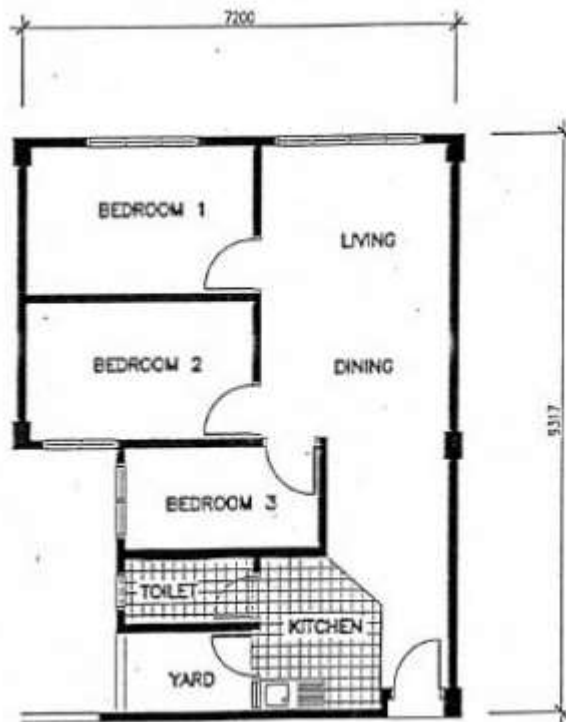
A typical layout plan for Low-cost Flat. (Source: National Housing Department (2006), JPN Standard Plan 2000)
